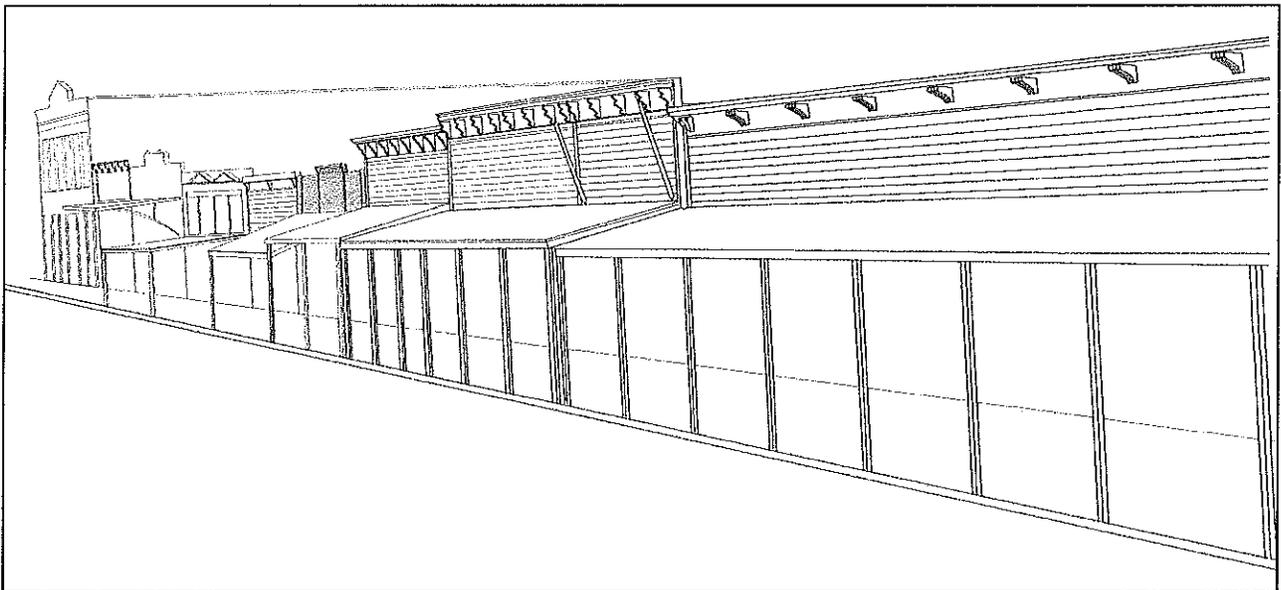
Conceptual drawing showing the 1st Street parking lots infilled with replica buildings.
